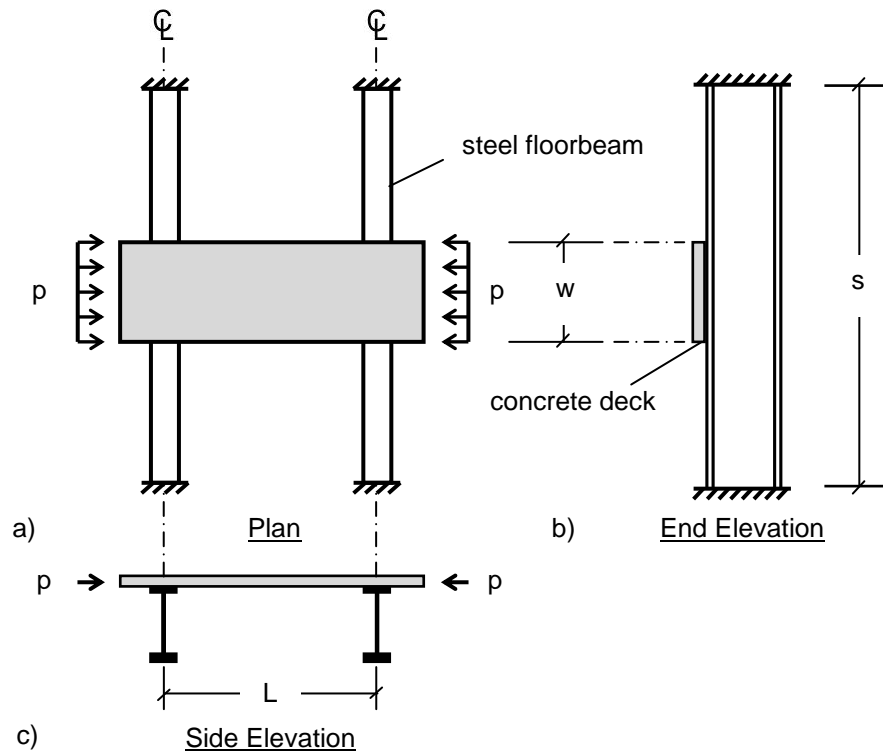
Concrete deck on steel floorbeams: a) plan; b) end elevation; and c) side elevation.
